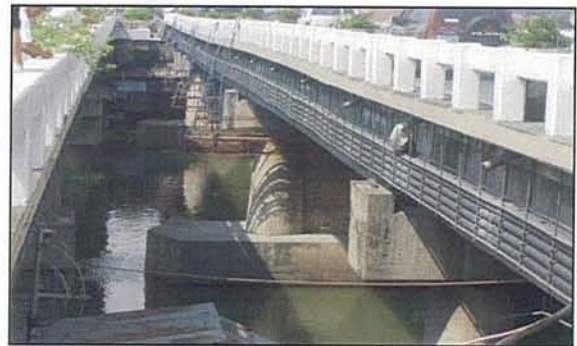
Miscellaneous / Utilities - PVC pipe lines attached at side of exterior girders
